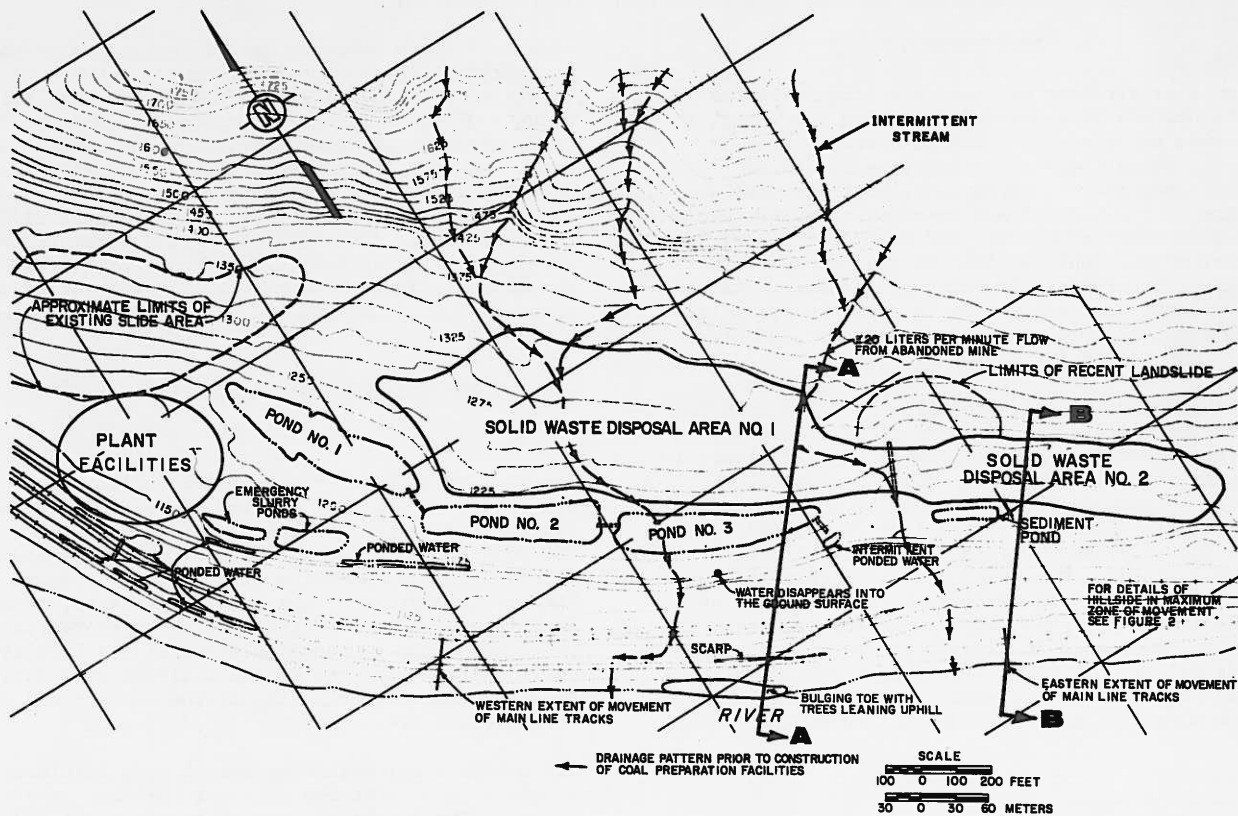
PLAN SHOWING SITE OF INDUSTRIAL FACILITIES
